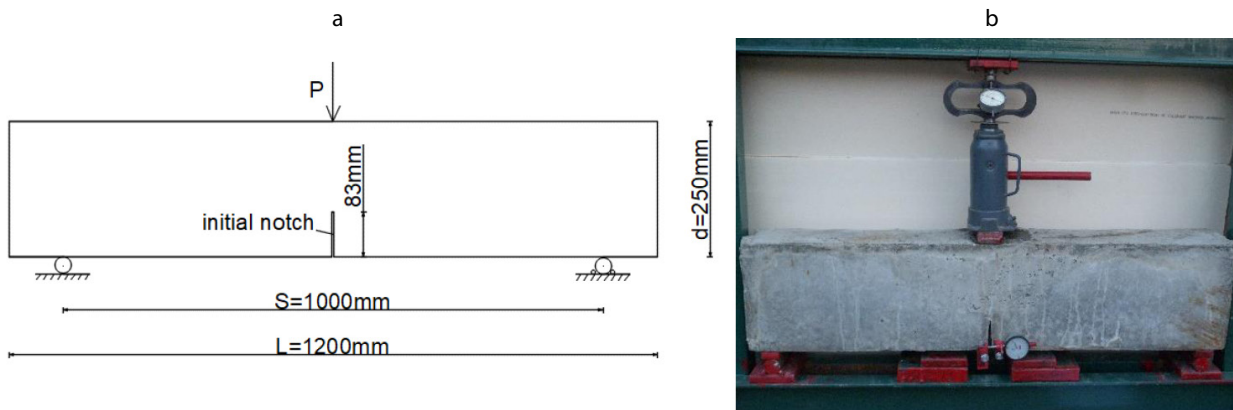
Scheme of testing of four experimental elements/beams, according to the RILEM method (a); view of the test stand (b)
